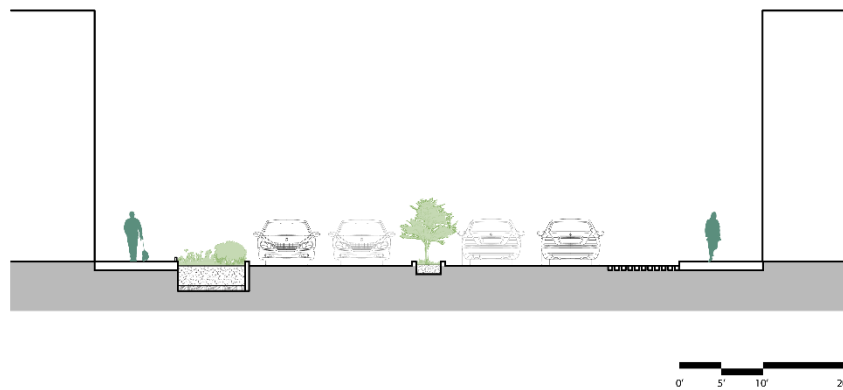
Bladensburg Road Green Corridor Section (Source: Author)
